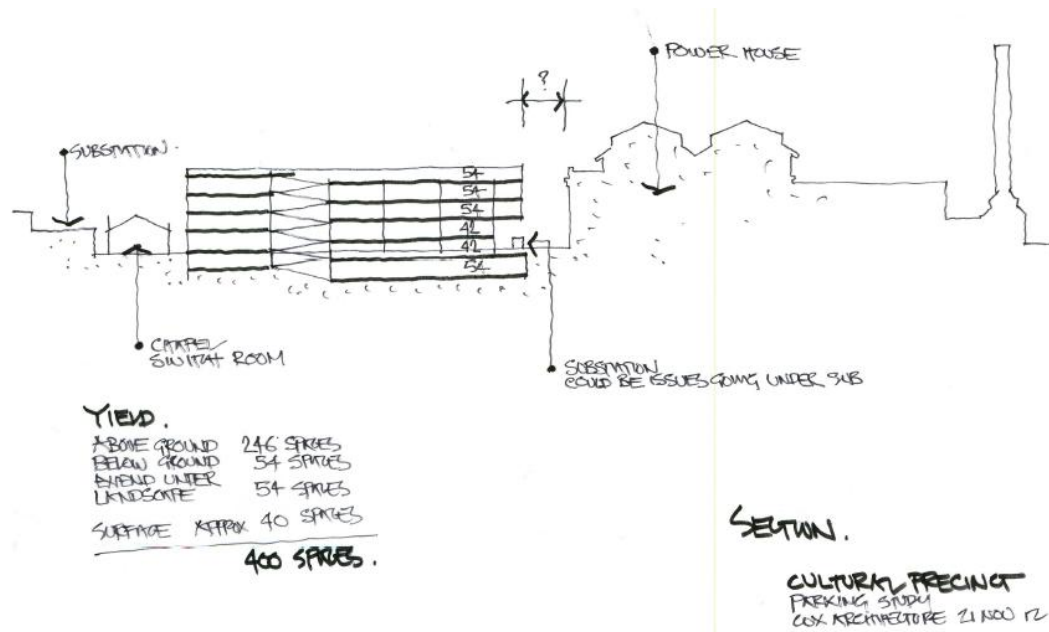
Concept sketch for structured car park between the Power House and the '1948 Switch Room' (2012).
